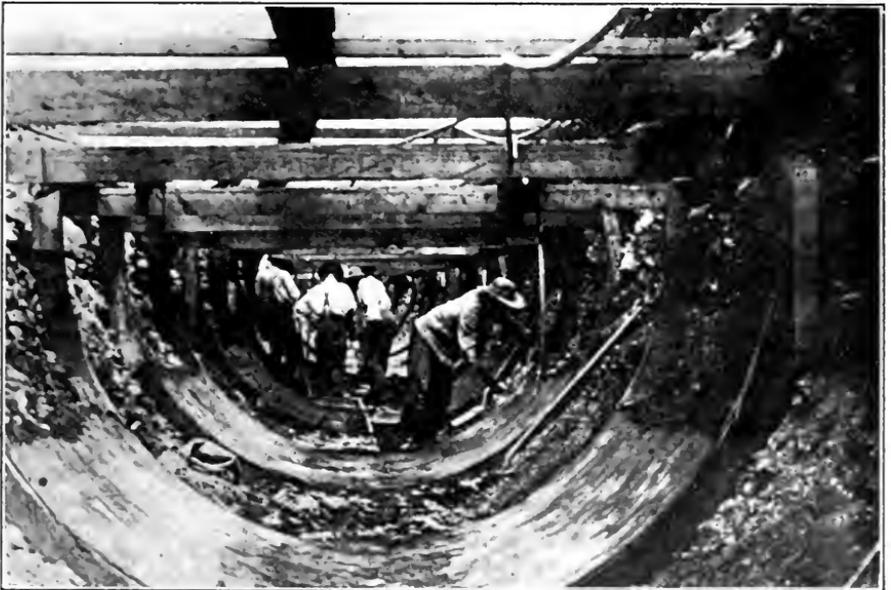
FIG. B.—Constructing semicircular concrete lining. Umatilla Project, Ore.
